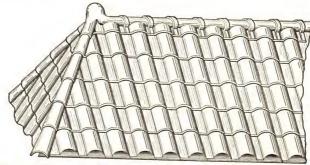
Section of roof showing modern Spanish tile, cresting, hip rolls and finials. (Akron Roofing Tile Company.)
